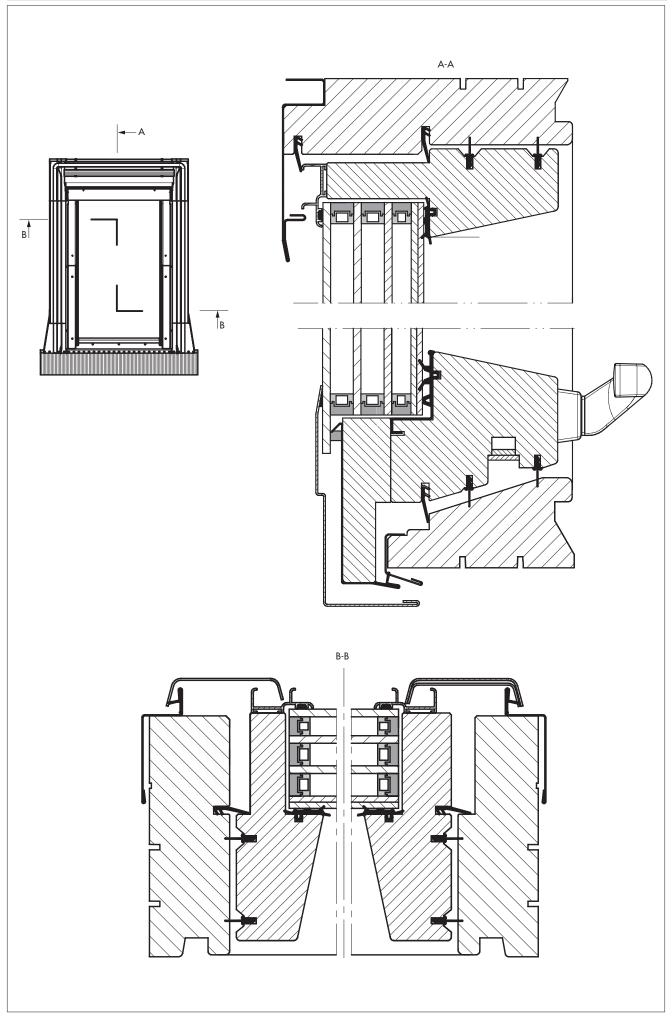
FTT U8 Centre Pivot Roof Window cross-sections
